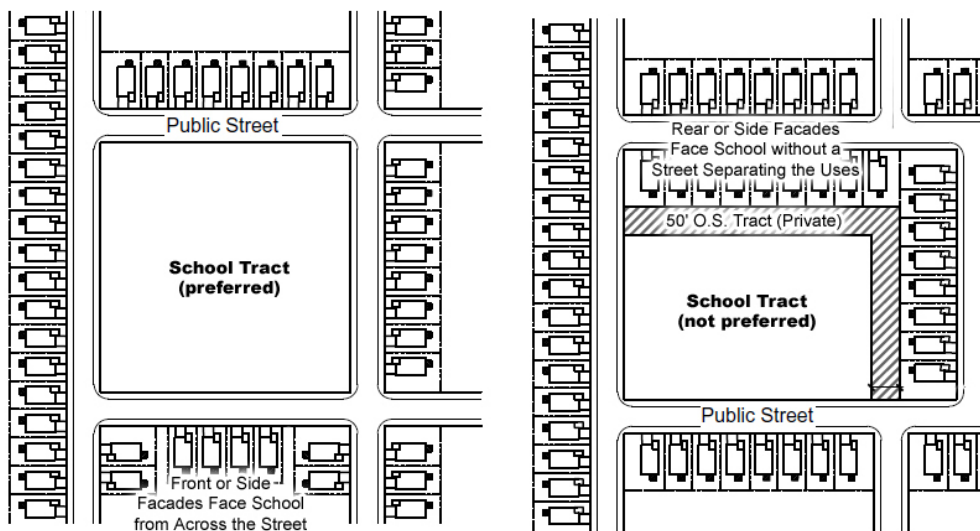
Neighborhood Layouts Adjacent to School (not to scale)
